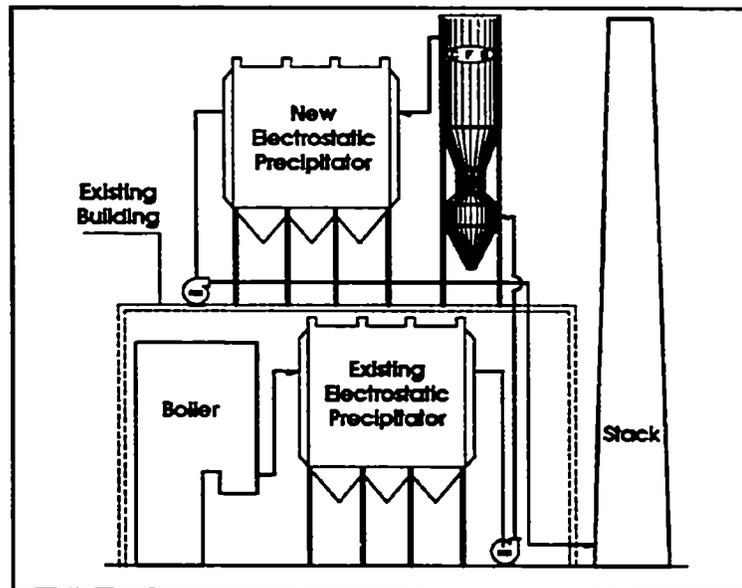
CFB Installed and New ESP Elevated above Existing Boiler and ESP
